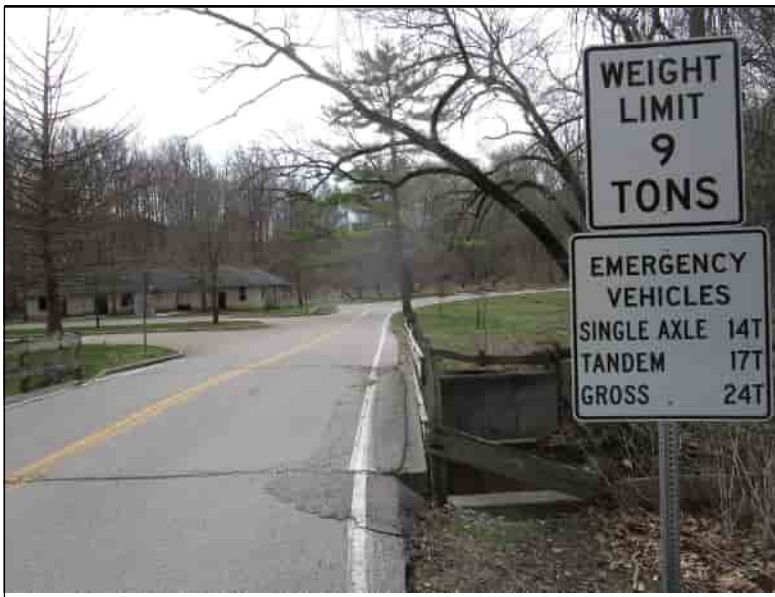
APPROACH LOOKING WEST LOAD POSTING
